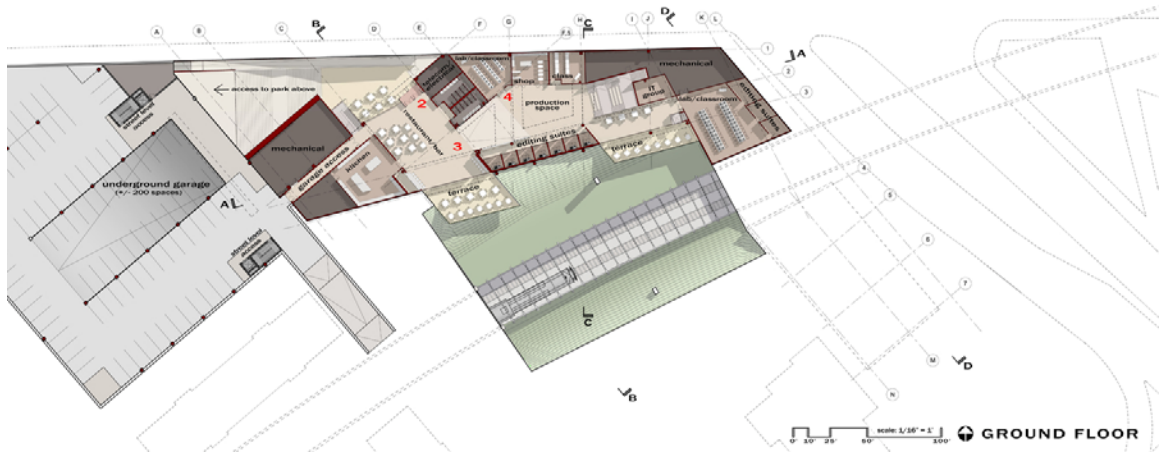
Ground Floor, Sunken level with direct access to underground garage
